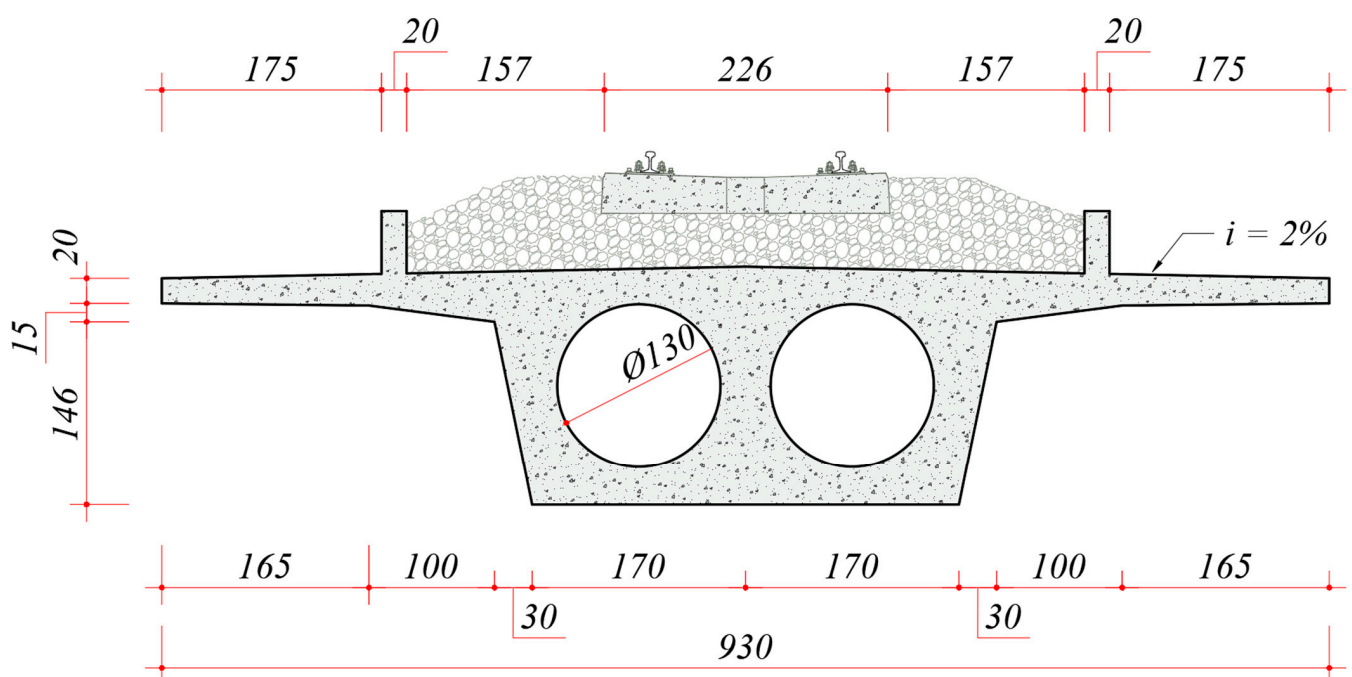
Idealized cross-section of the bridge numerical model (Adapted from [77]).
